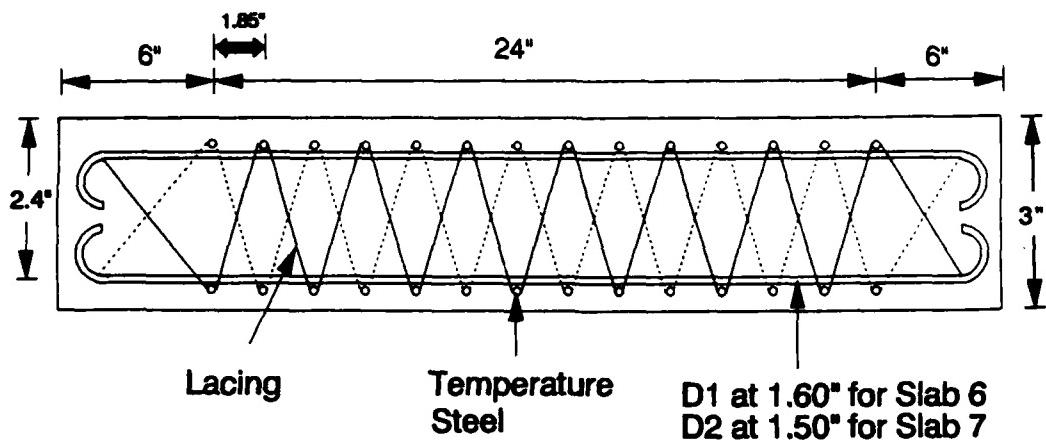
Sectional View Through Length of Slab Nos. 6 and 7
